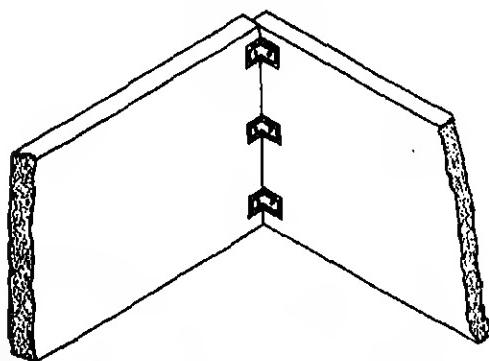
Typical "Dry" Vertical Wall-to-Wall Connection
